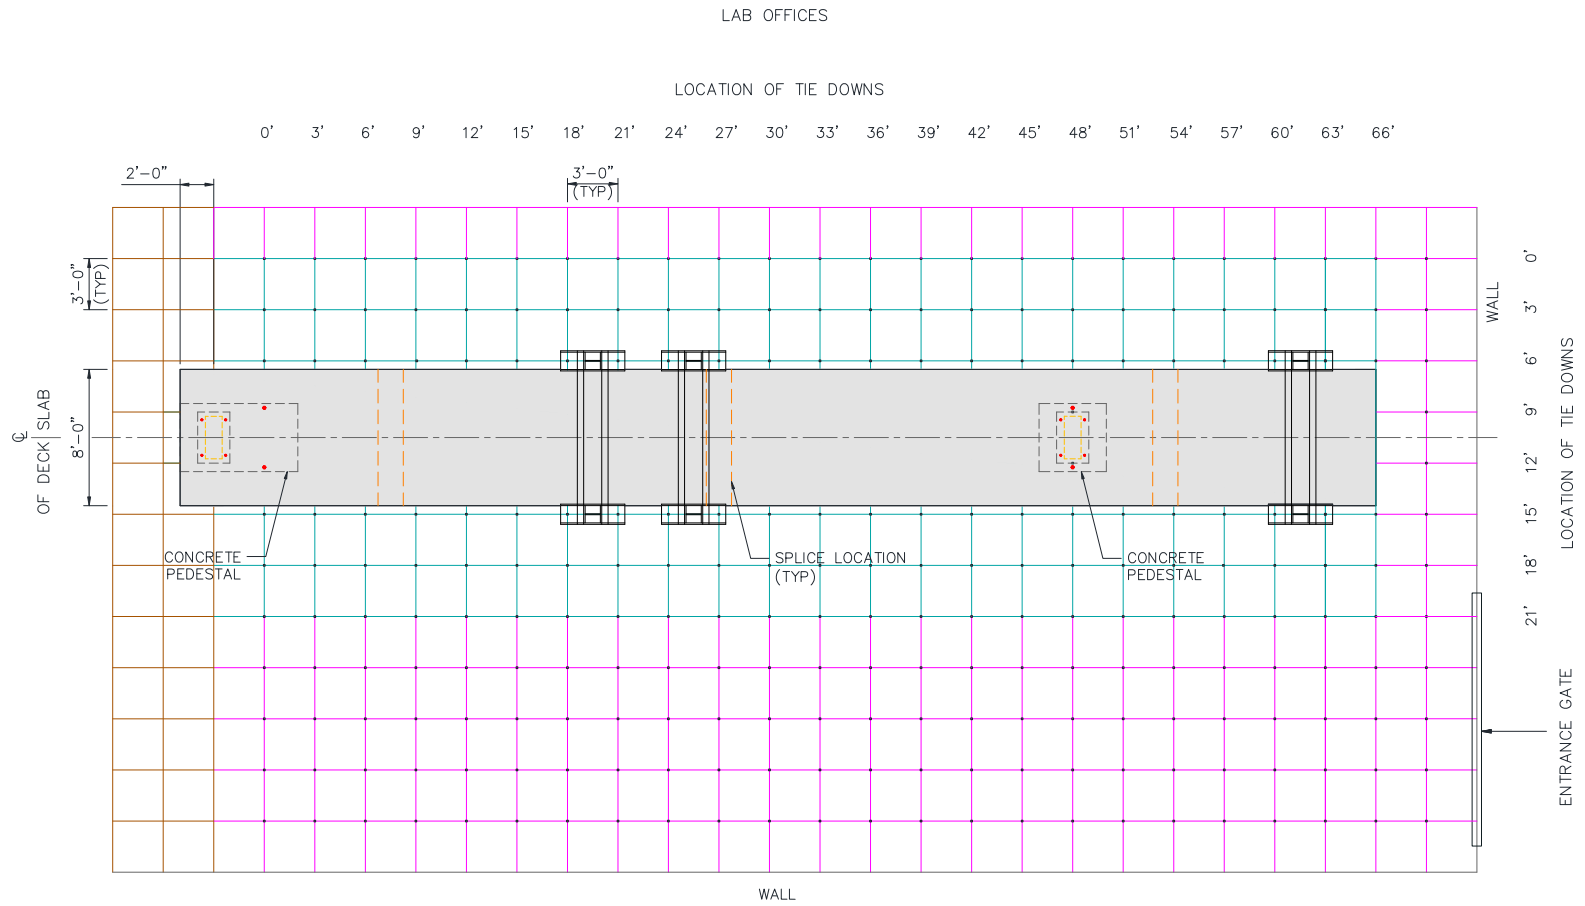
Plan View of the Test Specimen in the High Bay Laboratory.
